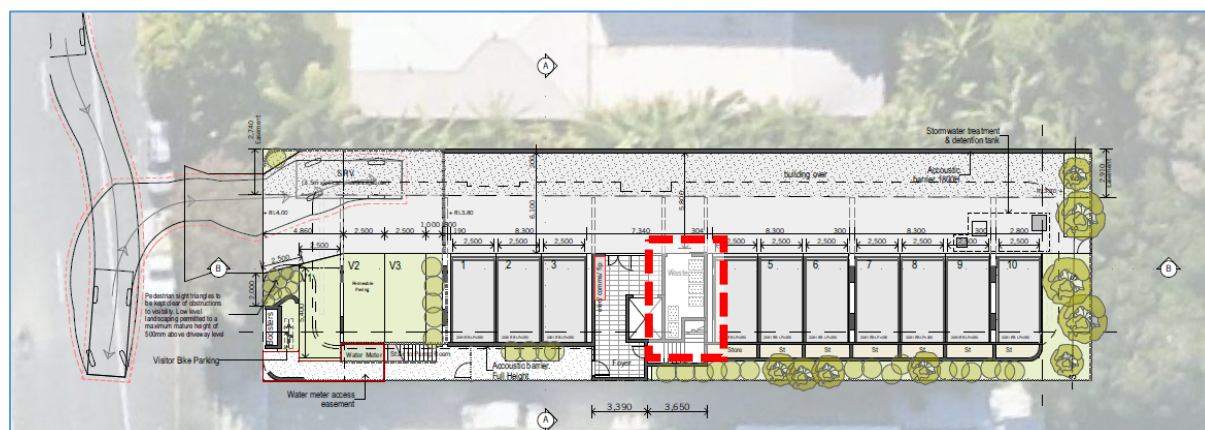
Proposal Plans Showing Waste Area (adapted from Lightwave)
